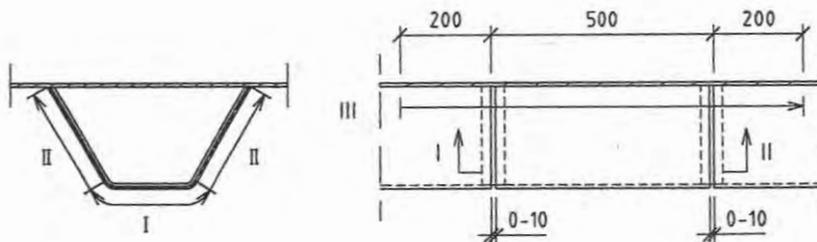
Welding details for in-fill member for U-rib (numbers denote weld sequence)
